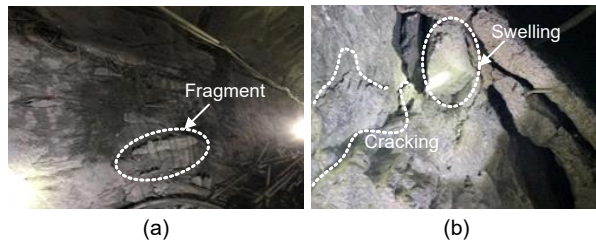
Failure types of rock surrounding the HSBT zones in the Yingliangbao underground powerhouse: (a) fragment damage; (b) swelling and cracking of the concrete
